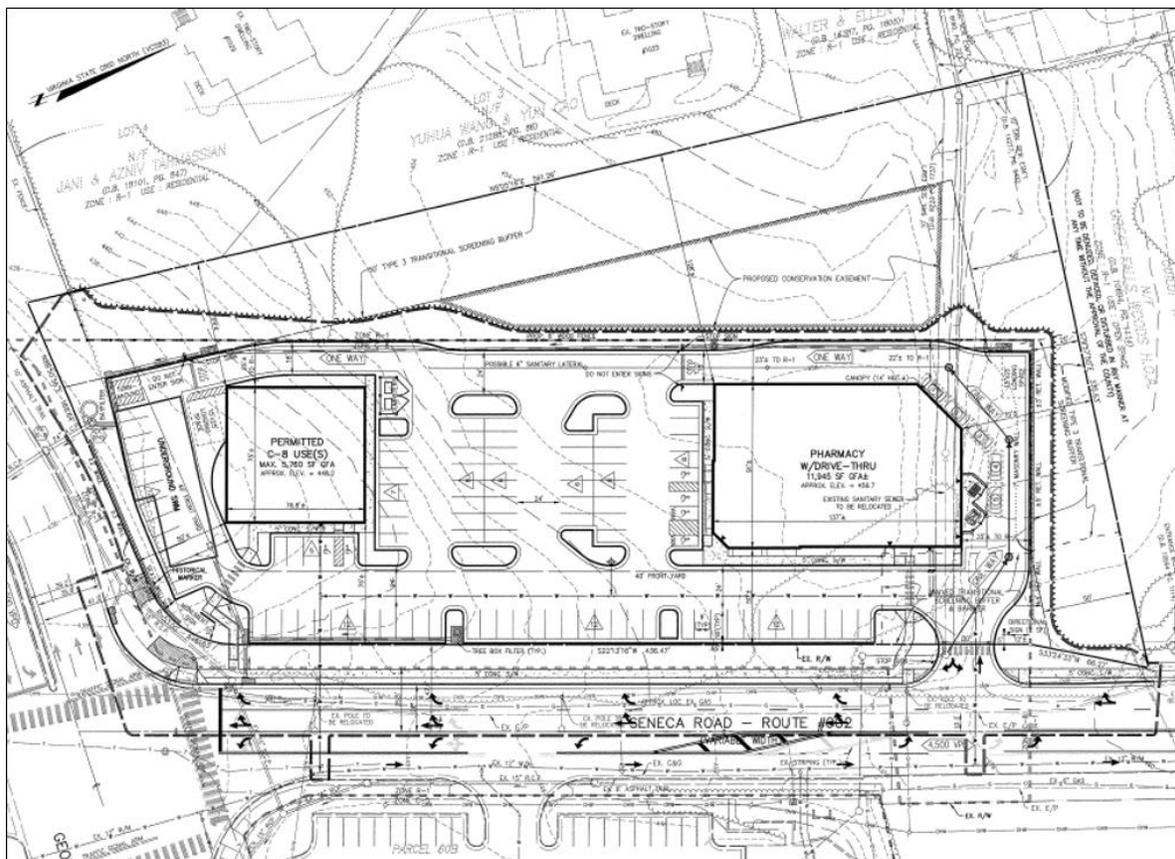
Site Layout (Source: SE Plat, Sheet 4)
